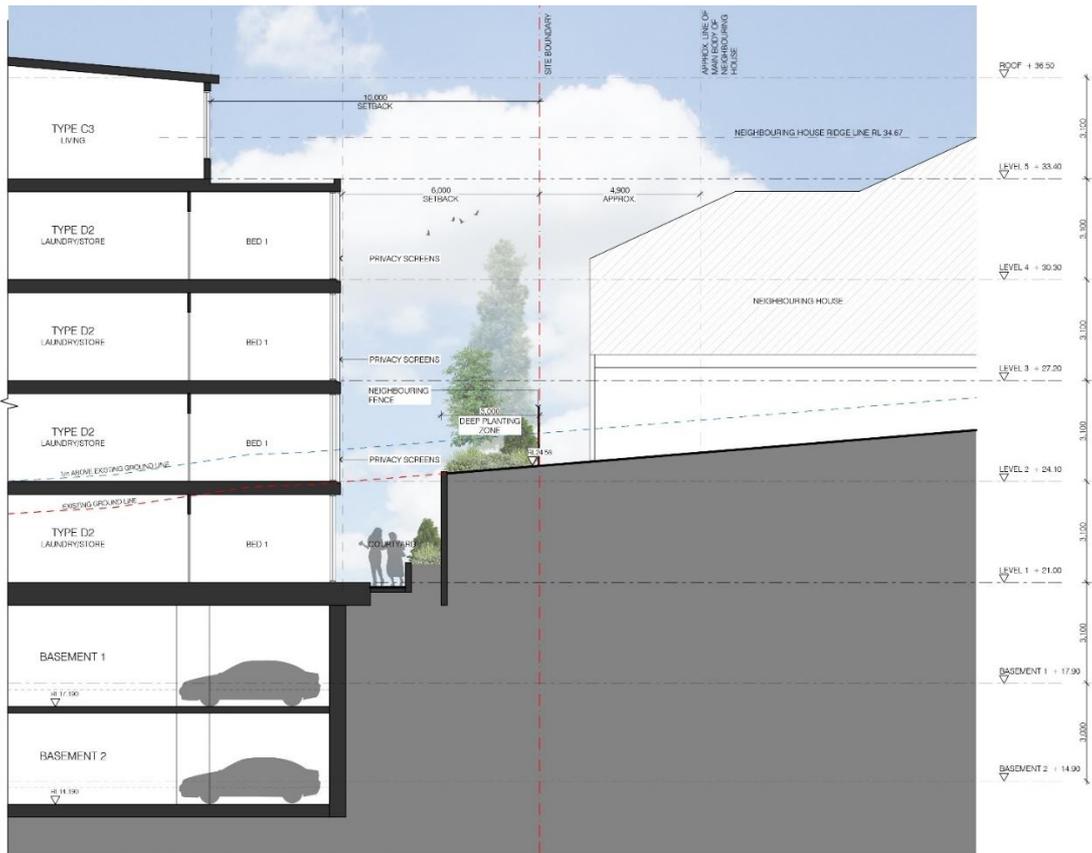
Longitudinal Section through the multi-unit dwelling development proposed for the subject site. It is noted that the building envelope of the proposed development up to Level 4 essentially correlates with the ridgeline adjacent to the rotunda structure on the heritage residence due to a combination of the sloping natural topography of the subject site towards the Lambert Road site frontage and the inseting of the ground level residential units within the alignment of the existing ground plane. The inset location of the Roof Terrace is also evident in this Section. (Source: bda Architects)
